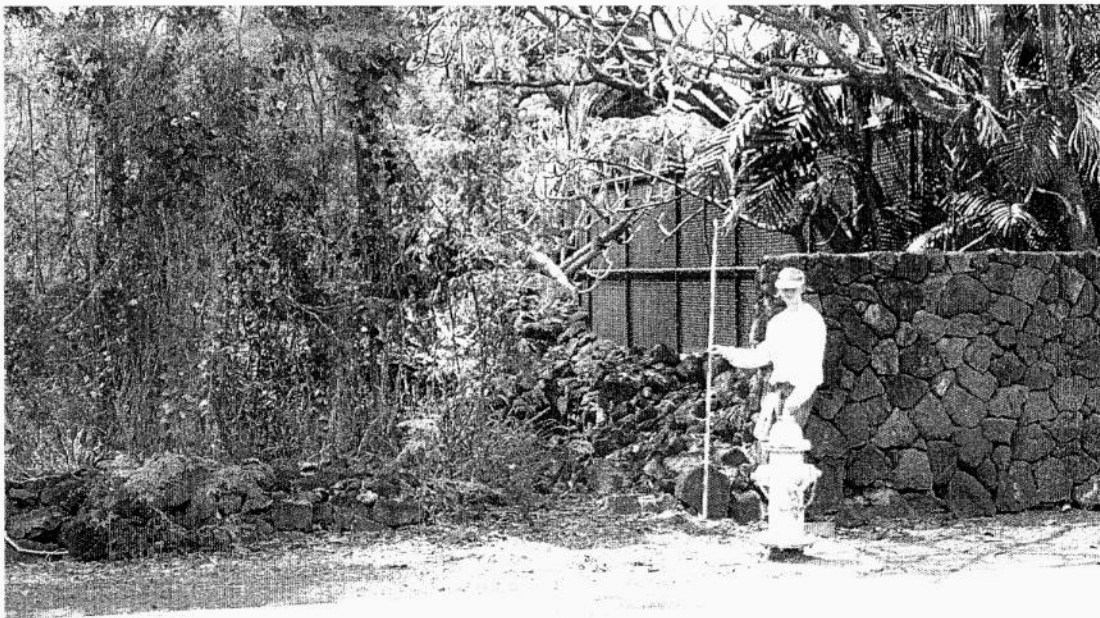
Disturbance at the property's north corner and adjoining newly constructed wall.
